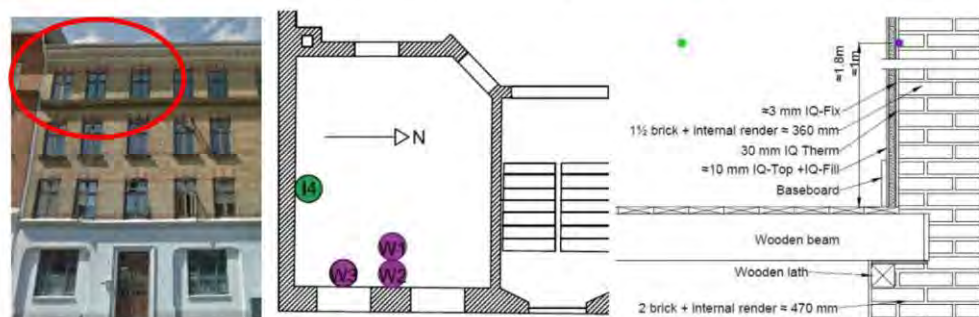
left to right; Thomas Laubs Gade facade with indication of insulated walls, sensor placement on floor plan, and construction with sensor placement.
